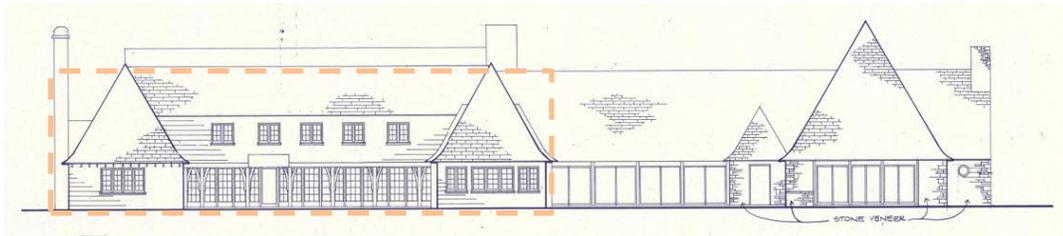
Plan east elevation (labeled south in the drawings) of the Main Lodge as recorded in 1983, not long after UCLA took control of the site. Original part of the lodge in dashed outline. Source: A-3, Exterior Elevations, Existing Lodge Record Drawings, Cashion, Horle, Cocke, Gonzalez Architects, May 26, 1983.
